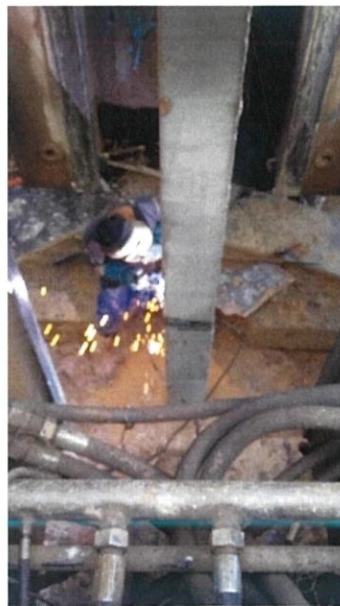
show the both of the pile are joint by using welding set.
